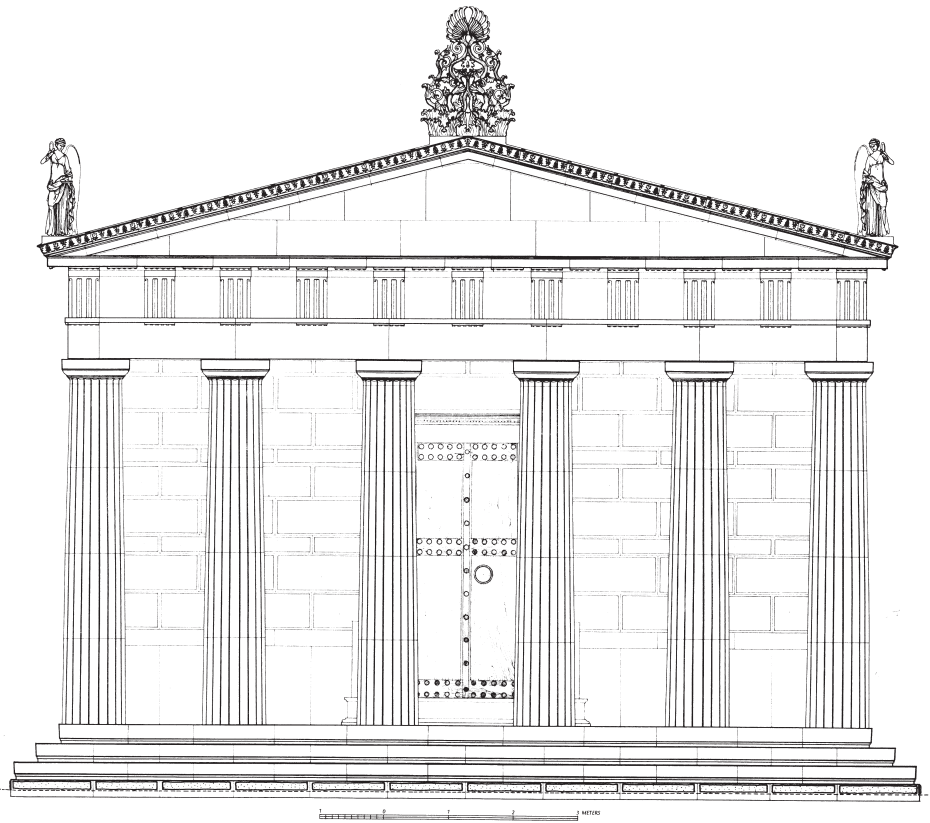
Hieron. Restored elevation of facade. After *Samothrace* 3, pl. CVIII.
